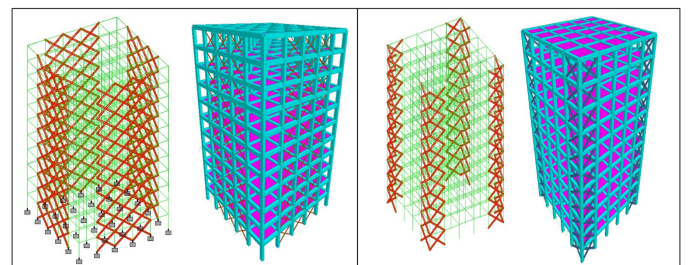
3D View of RC Frames with Diagonal and X-Bracing Systems
